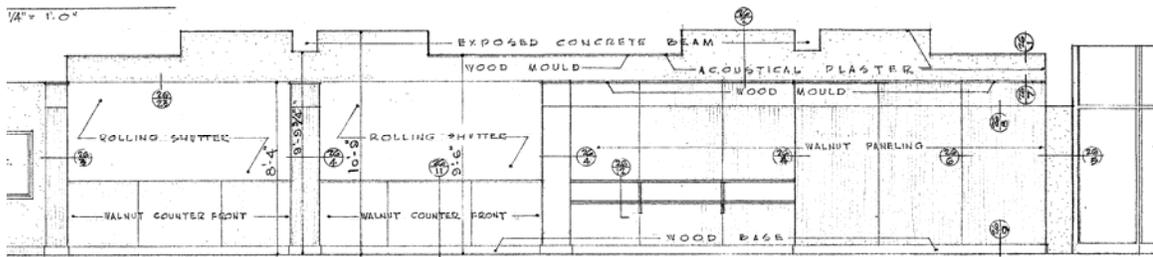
Original Construction Document, Elevation of Desk and Mail Area [9]
